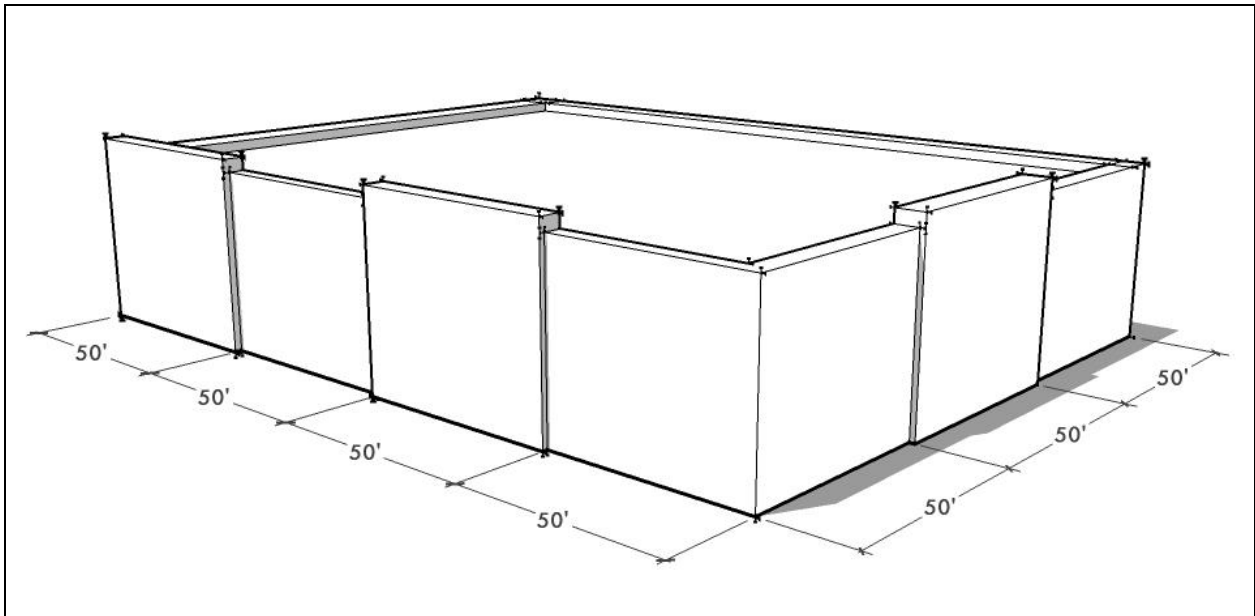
Example of facade articulation with projections and changes in building height.
